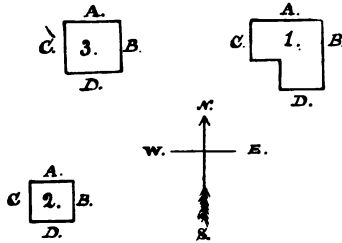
Plan showing position of Chimney-stacks at Mr. Shenstone's.)
